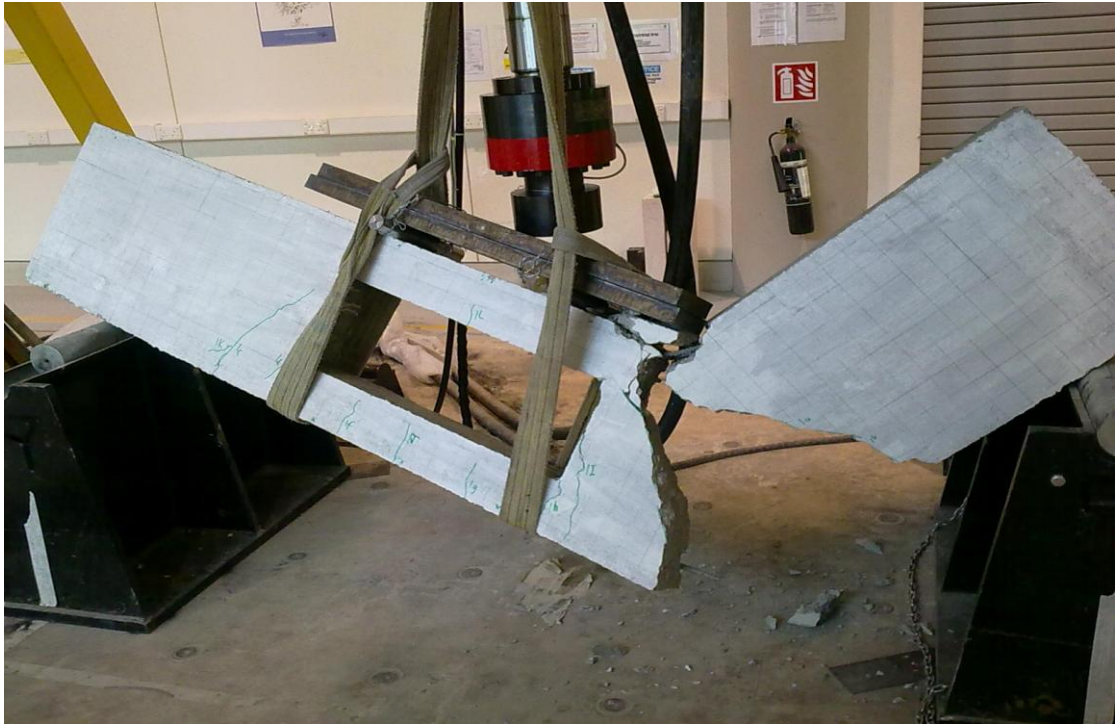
Failure Mode of Beam with Rectangular Opening with Additional Reinforcement Bars along the Edges subjected to Cyclic Load
